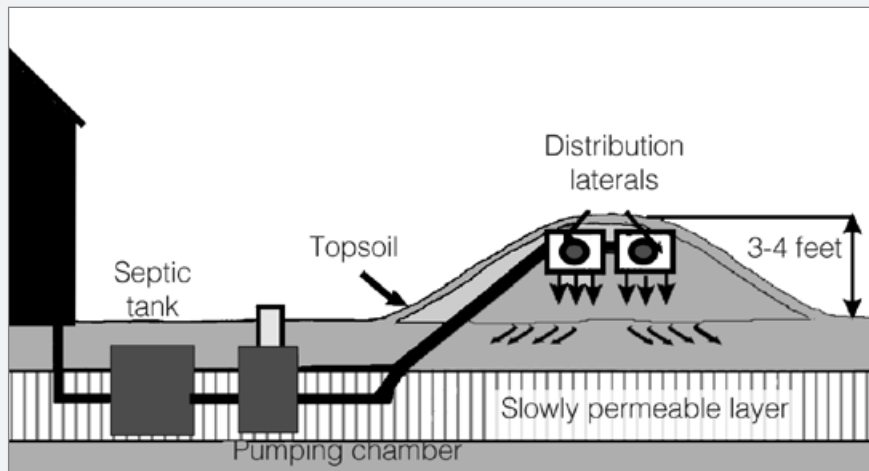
A cross-section showing the components of an elevated sand mound system.
